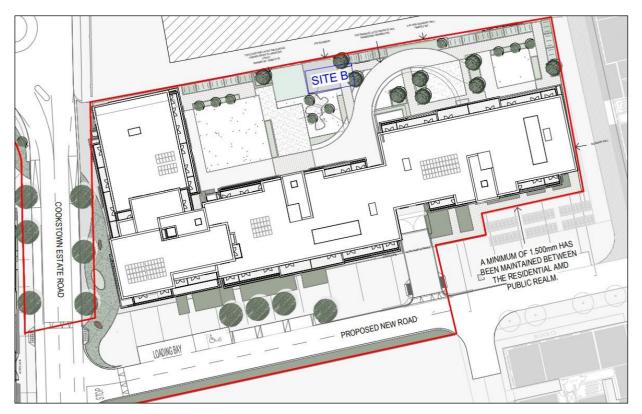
Site Plan for Site B proposed under Section 247 Meeting Ref. No. SHD1SPP021/18)
